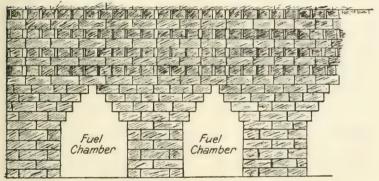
BRICK KILN. SCALE %inch = I foot.
